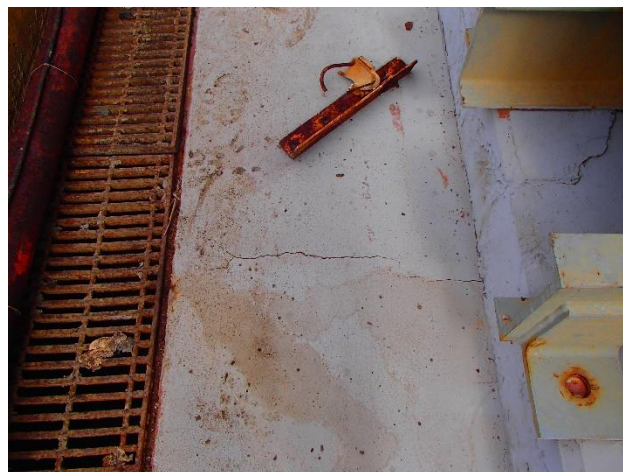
Cracks in secondary containment near Slurry Tank TK-5210.
